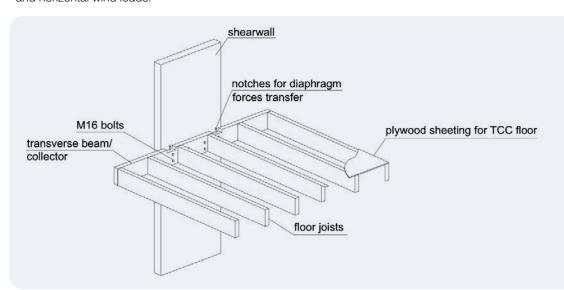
Transverse beam with notches for the diaphragm force transfer.
